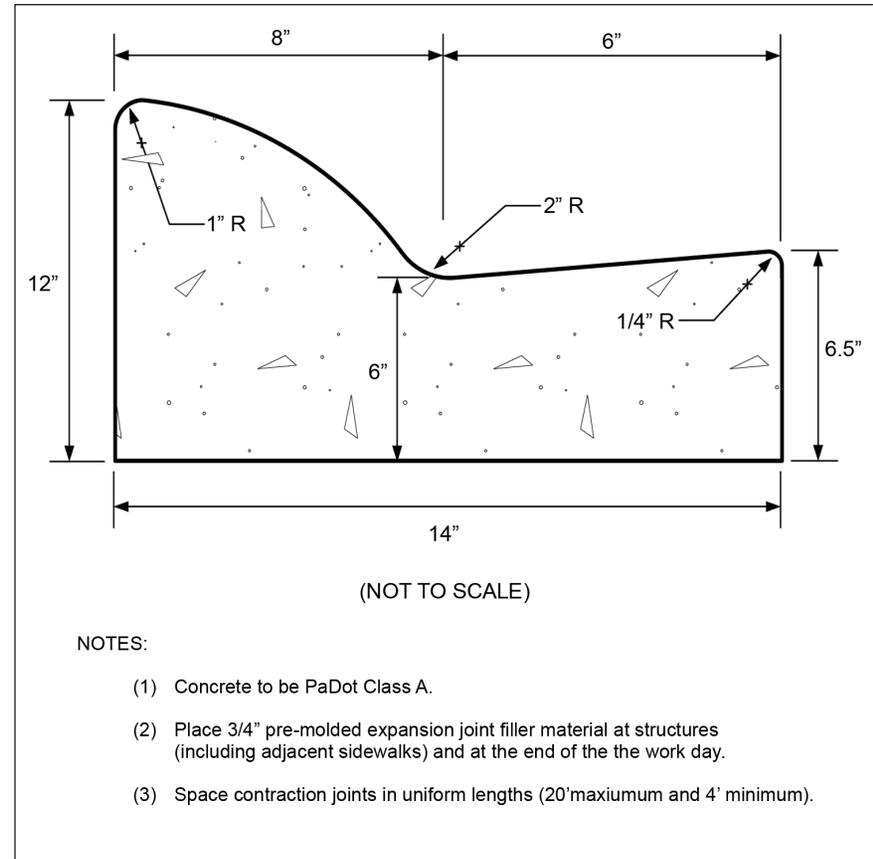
Concrete Rolled Curb and Gutter Detail
